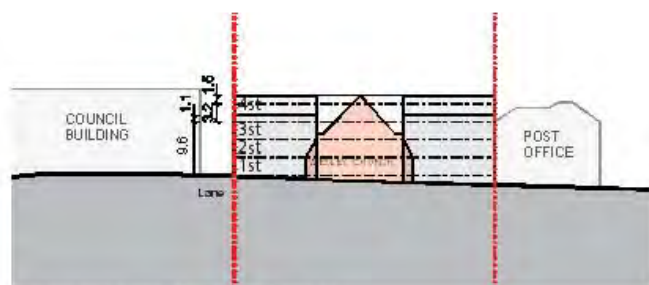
Wetherill Street _ Building envelope _ Section B-B
